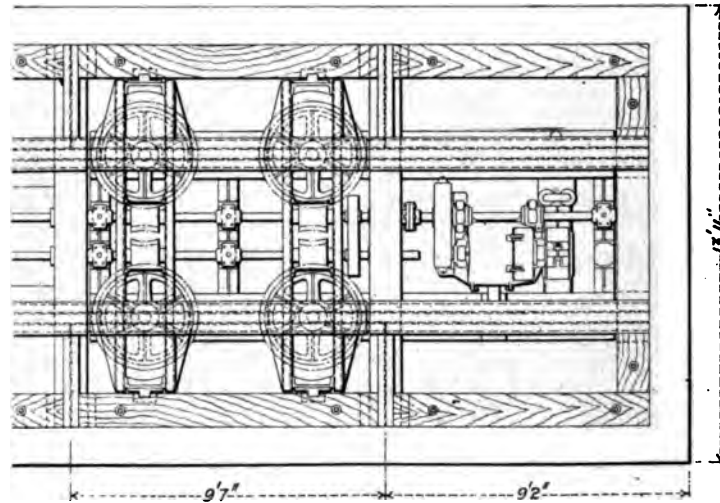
DETAILS OF ENGINE PITS AND ROUNDHOUSE FLOOR AT EAST ALTOONA, PA., P. R. R.
